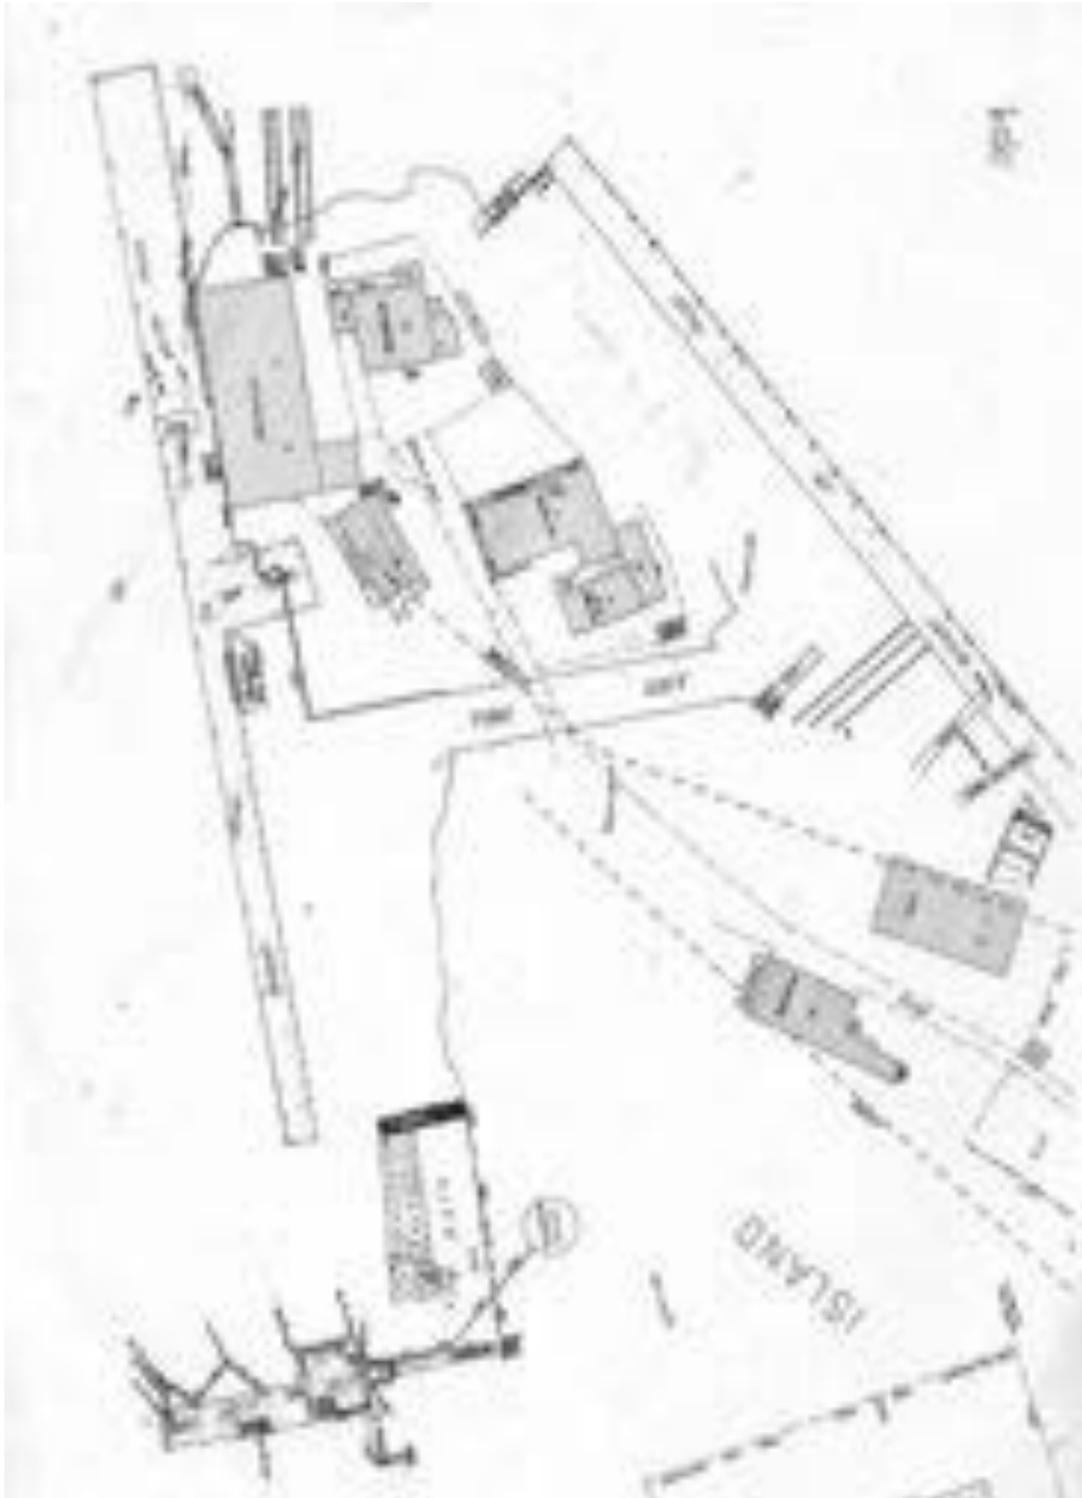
A detailed plan from 1929 (part of plan of whole island), nearing the end of the Harbour Trust's tenure, showing the northern area of the island with more detail of the layout of the buildings and wharves. It is interesting to observe the range of small buildings, sheds, boatsheds and ramps around the edge of the water, the full length of the cut that was modified around 1960, the fence line of the Harbour Master's residence and what appears to be the incorporation of one of the magazine buildings from 1875 into the residence visible in the centre of the drawing.
